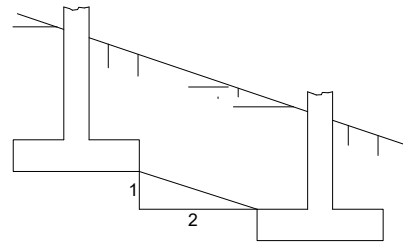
DETAIL OF LIMITING SLOPE OF ADJACENT FOOTINGS
